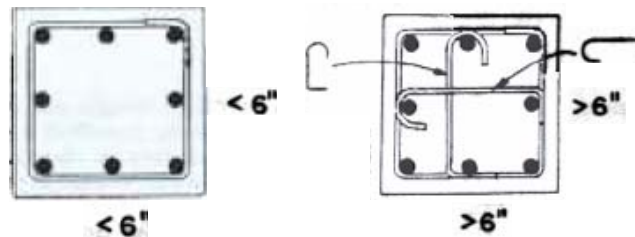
Standard practice for reinforcement detailing of reinforcement in RC columns, 1970 (Concrete Reinforcing Steel Institute 1970).
